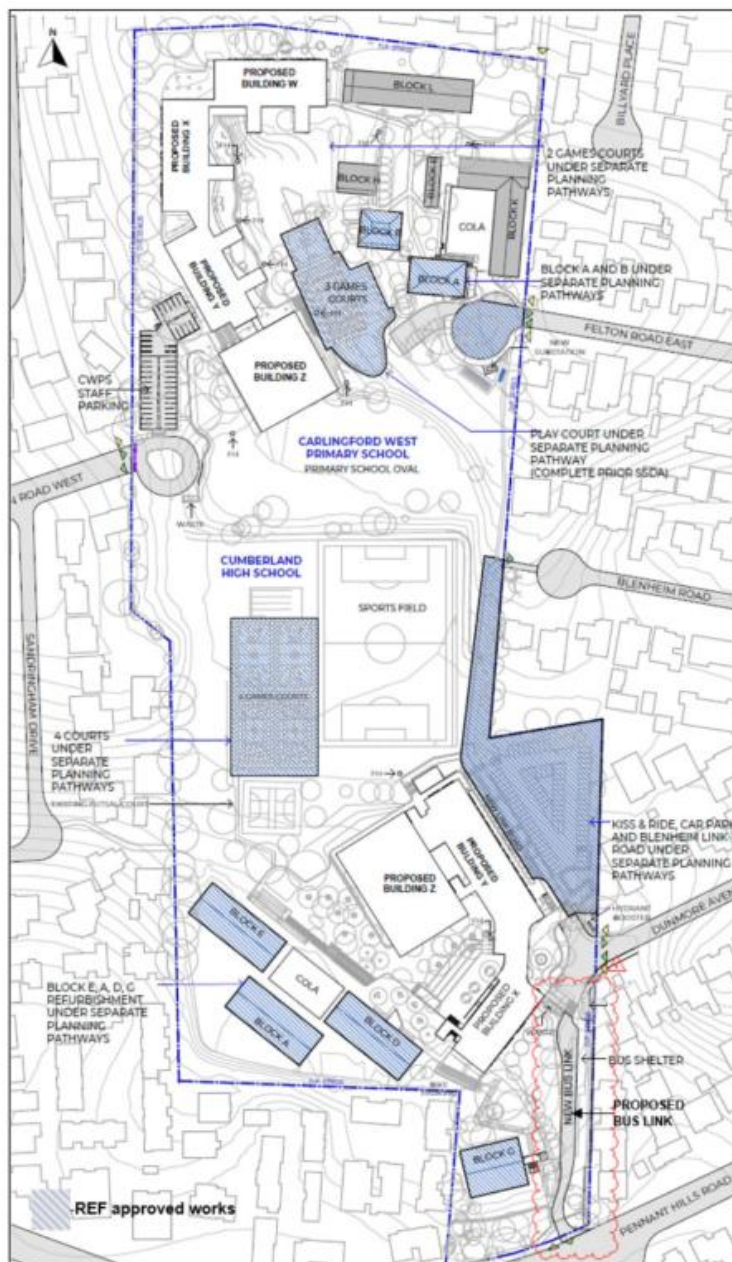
Proposed Site Plan (Source: Assessment Report, DPHI November 2023)
